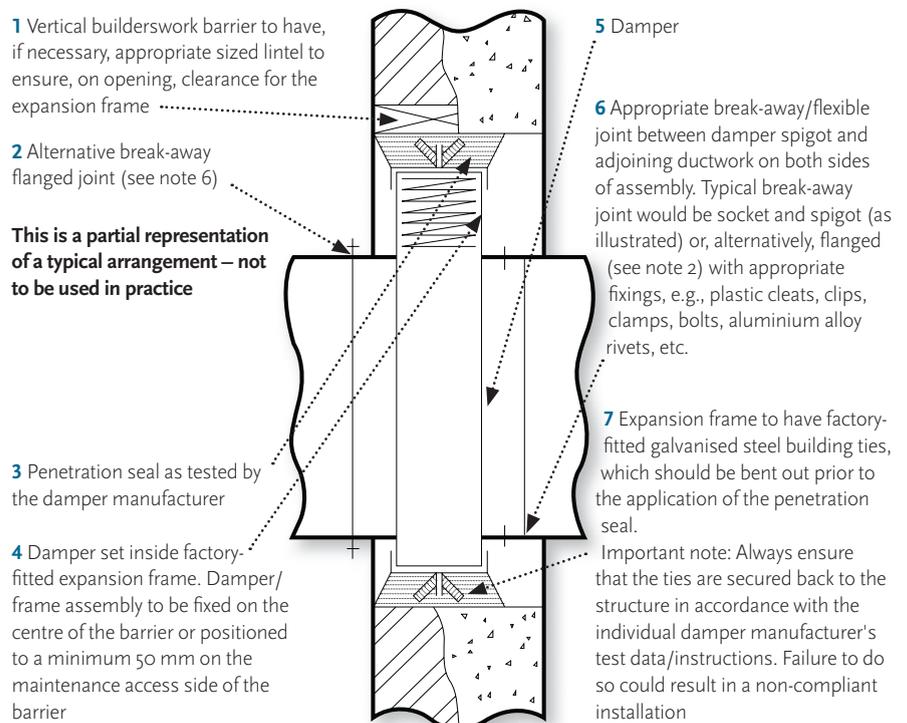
Partial extract of fire damper installation detail (Source: DW/145)
